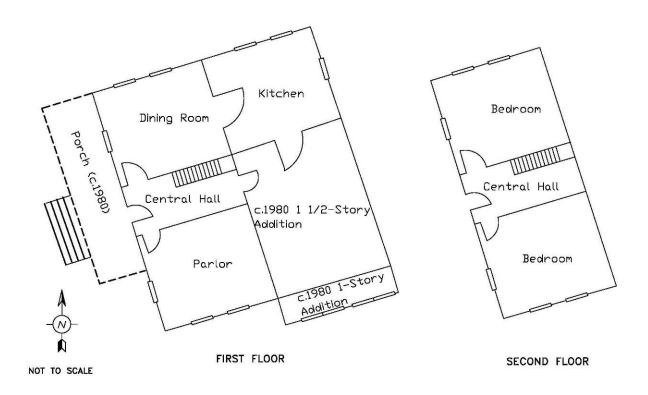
Anticipated Floor Plan of the J.C. Sanders House Based on Exterior Observations and 1985 Survey Documentation
